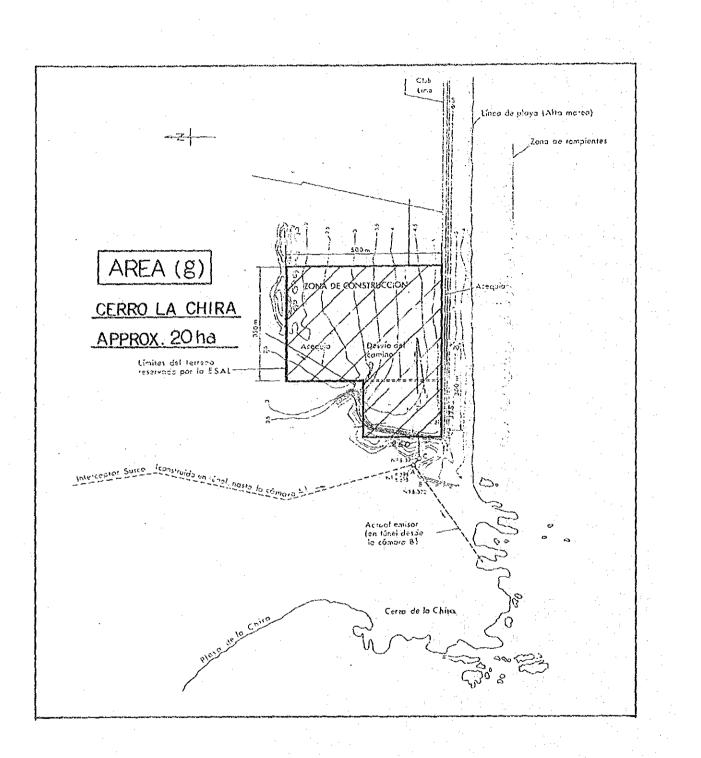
PROPOSED AREA (g) FOR SEWAGE TREATMENT PLANT, CERRO LA CHIRA.
